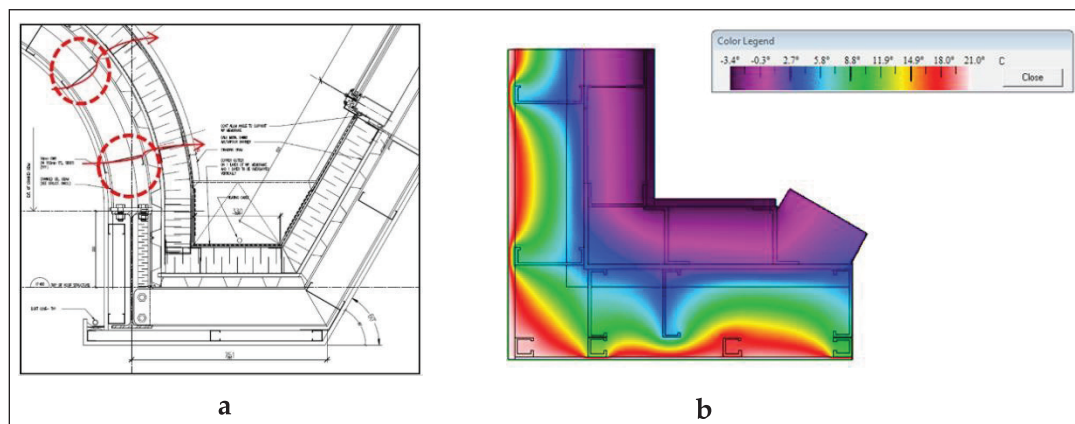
(a) Construction detail shows different layers of the exterior wall: Copper cladding, Z girts, rigid insulation, metal clad, steel studs and drywall. B) Thermal simulation using THERM 7.4.4 showing colder areas within the building wall system (b) (by the author).
